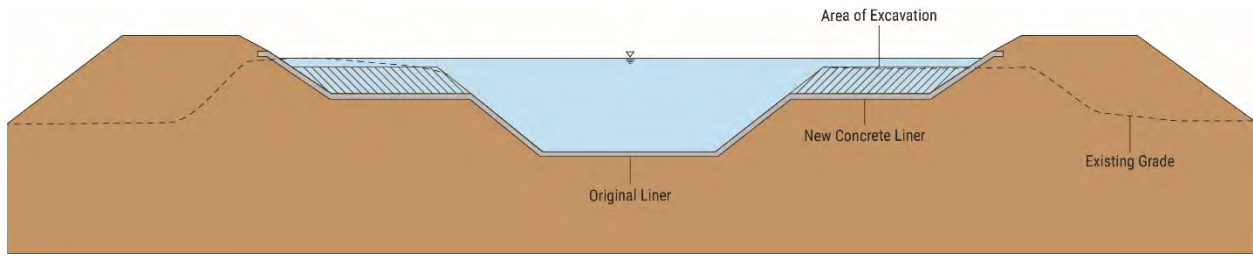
Compound Trapezoidal Cross Section in the Parallel Canal Alternative
